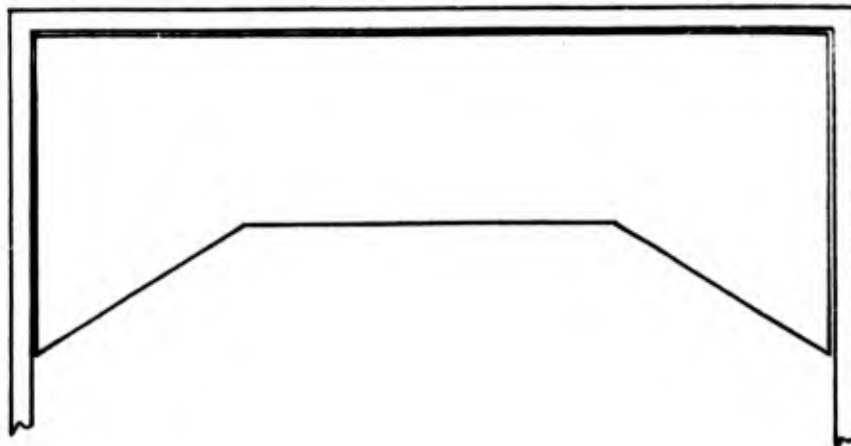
PRELIMINARY PLAN VIEW OF CONSOLE AREA
